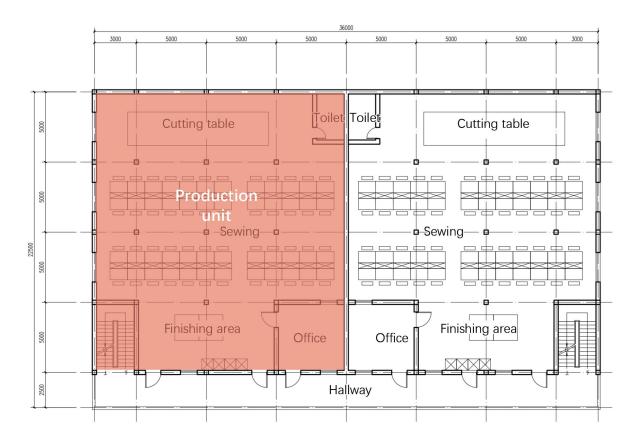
Spatial layout and division of function of production space of a certain scale (source: the author)
